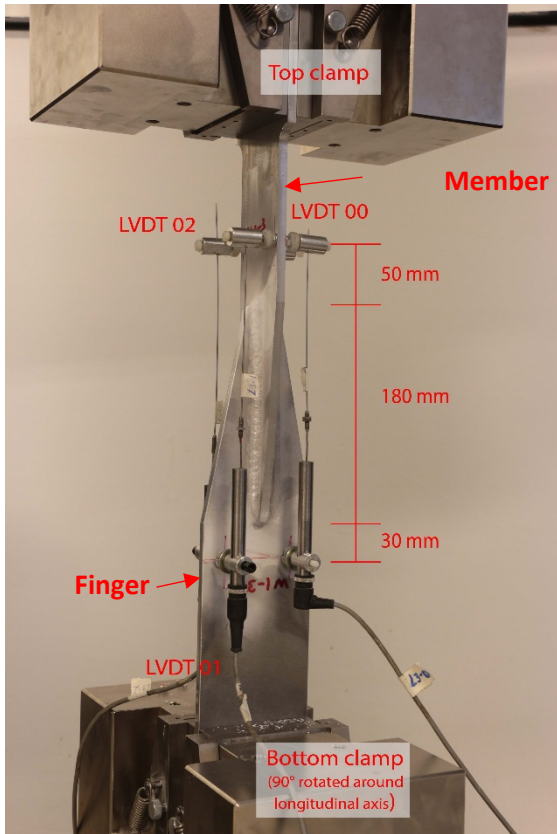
Test set-up of the welded cruciform (W1-3) in practice.
